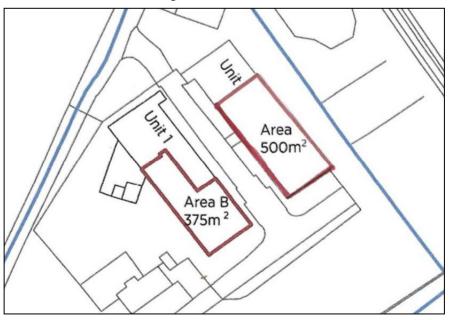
Extent of Authorised/Approved Storage and Flexible Uses
